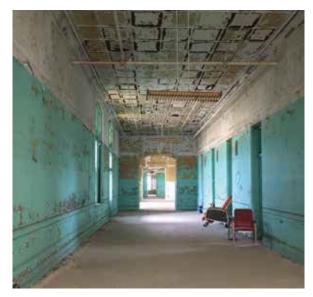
Dayroom, Room 29, second floor. Paint finishes are primary concern (CJSA 2019).
